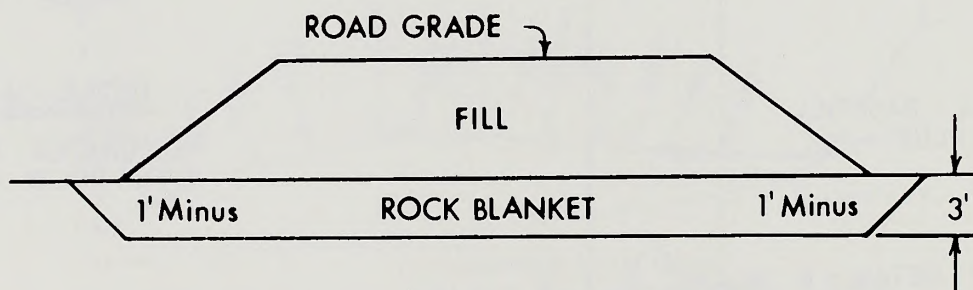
A sample design for a rock blanket to support a road fill on soft ground. A core trench is excavated and filled with one-foot minus riprap and compacted in layers not greater than one foot in depth to create a rock blanket. The material excavated from the core trench may be used as fill material.
